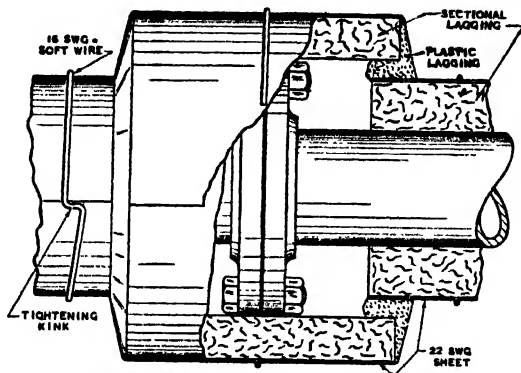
SECTIONAL MOULDED LAGGING ON PIPE FLANGE PROTECTED BY SHEET STEEL
